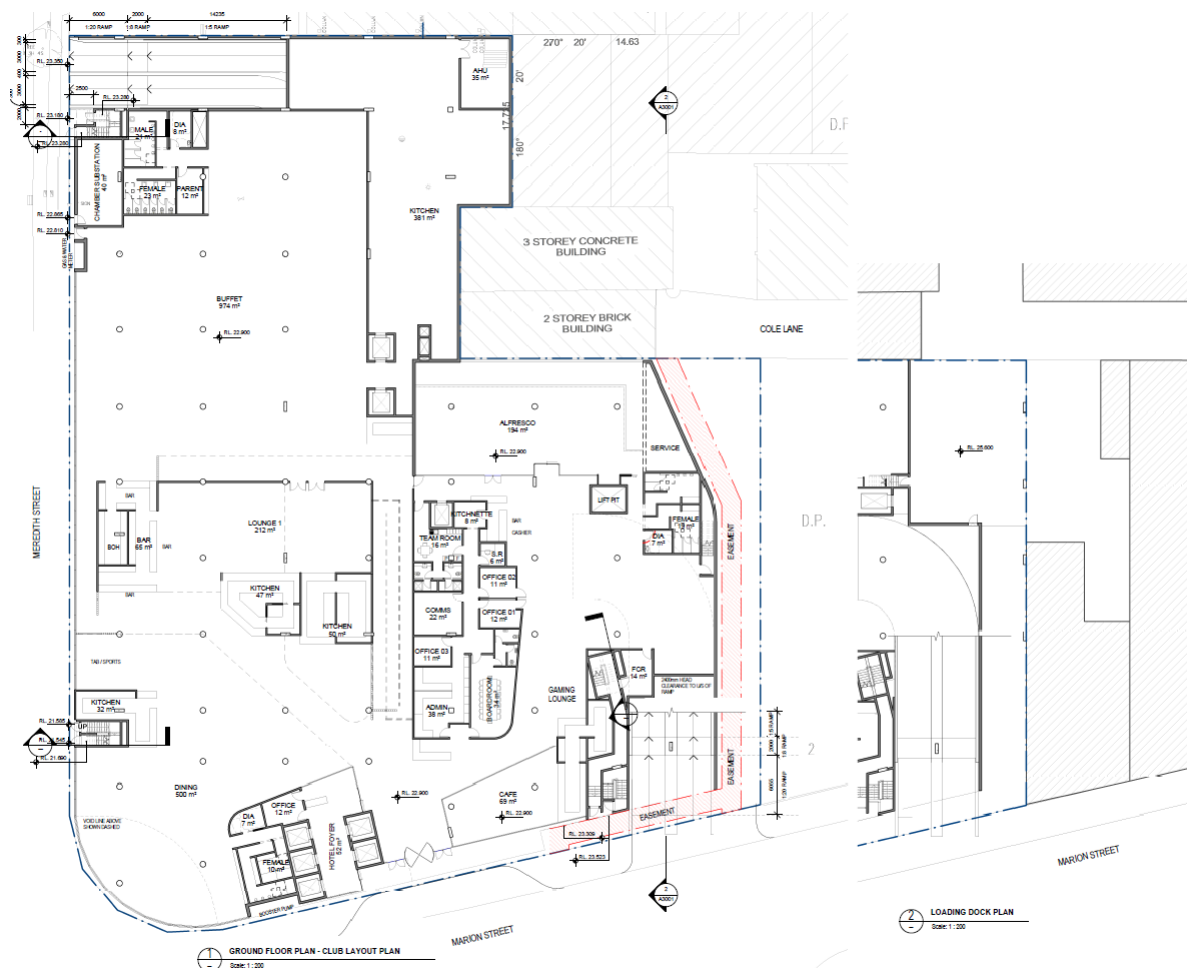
Ground Floor plan showing Loading Dock Access and Carpark Entry and Exits
